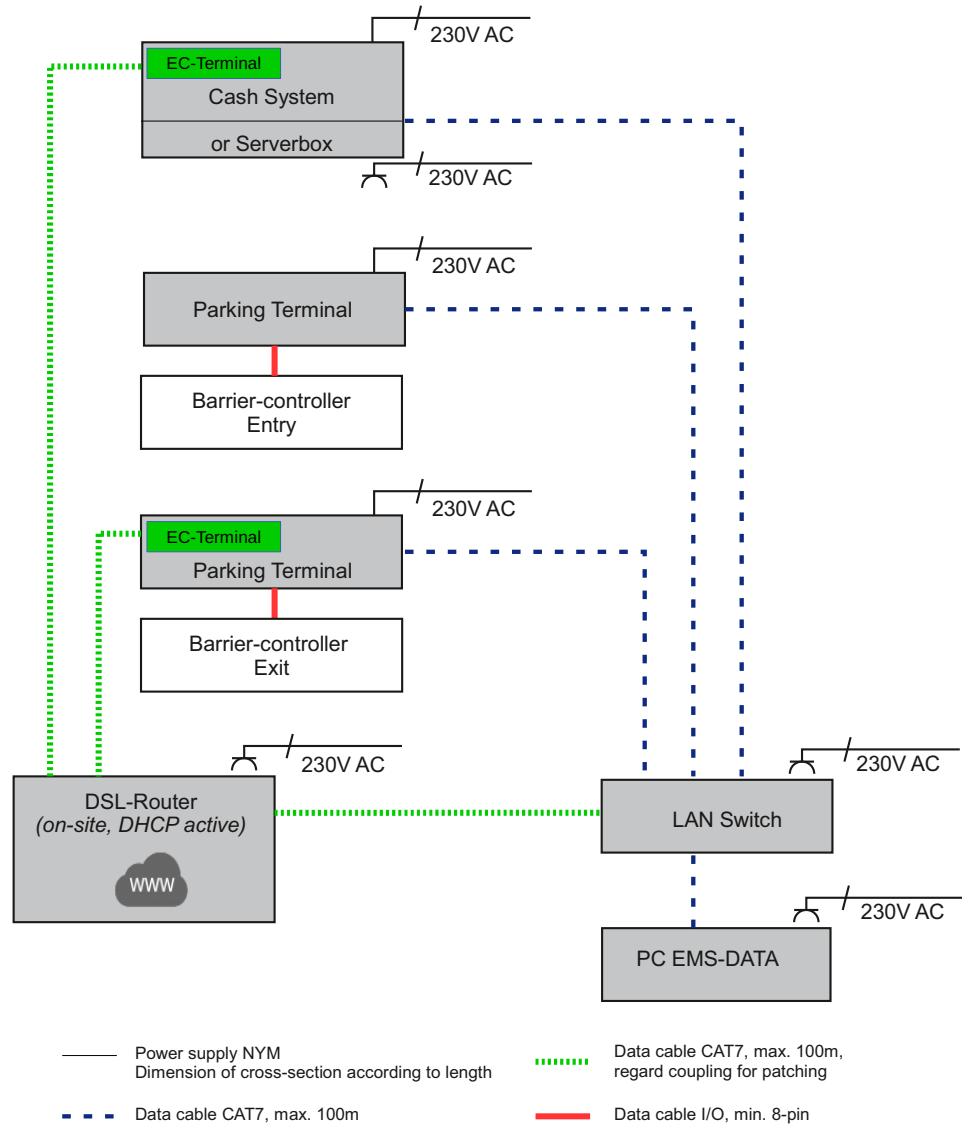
Cable plan car entrance/ exit terminal with max. configuration
